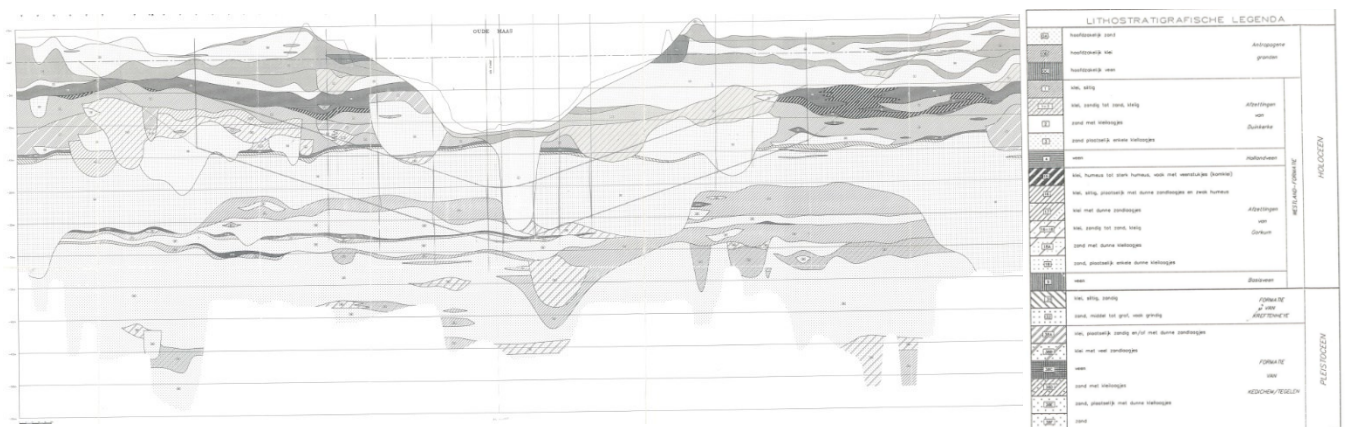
GEOTECHNICAL LONGITUDINAL SECTION OF THE TUNNEL (GRONDMECHANICA DELFT, 1994)
